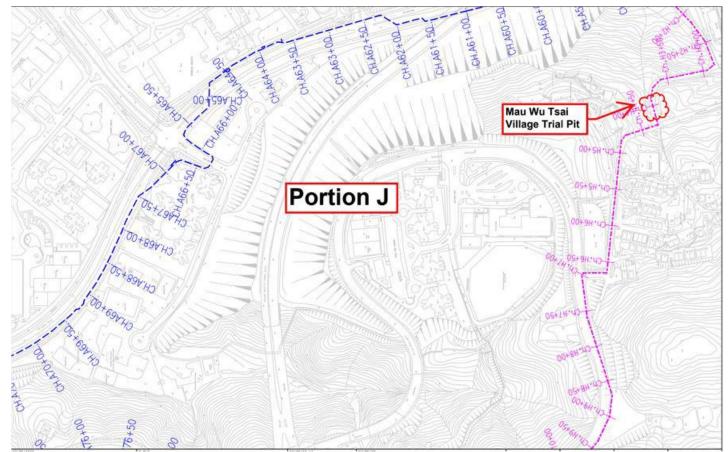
Location Plan for Portion J - Mau Wu Tsai 2 (Po Lam South Road 2)
